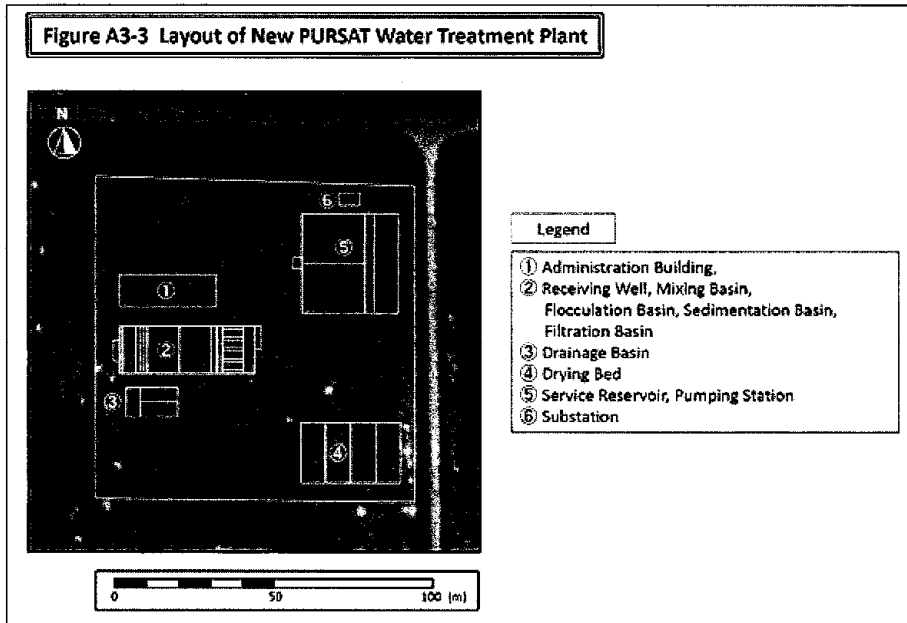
Layout of New WTP (one of the alternative layouts) ③
